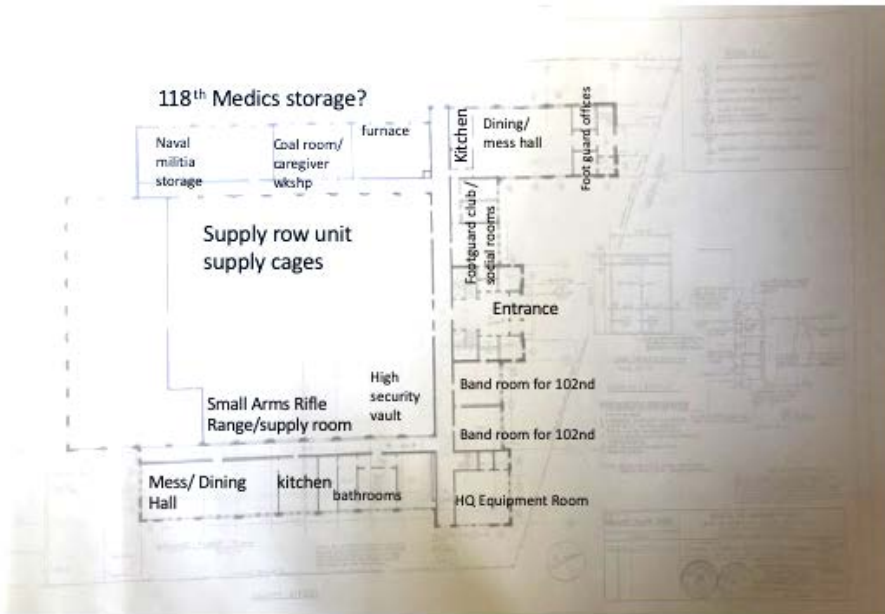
Plan of Building Layout, historic room use. Drawing of Ground/First floor, Sapienza and Lessig Architects and Planners, Bureau of Public Works, State of Connecticut, February 21, 1986.
